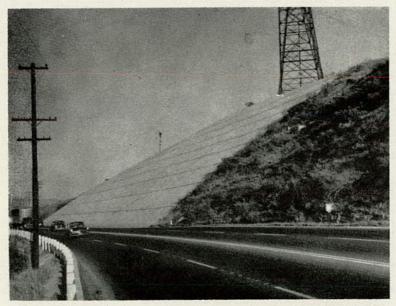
Restraining structure; concrete slope paving placed monolithically with an underlying grid of reinforced concrete beams, to prevent slide movement of unstable cut slope near Valona, Calif. (Photograph by E. W. Herlinger, courtesy of California Division of Highways)
